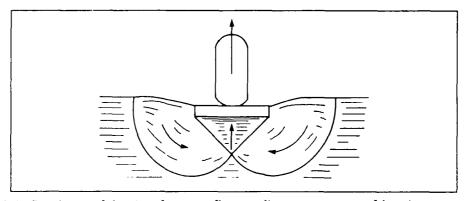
Breakout of footing from seafloor sediments, reverse of bearing capacity or sinkage.
